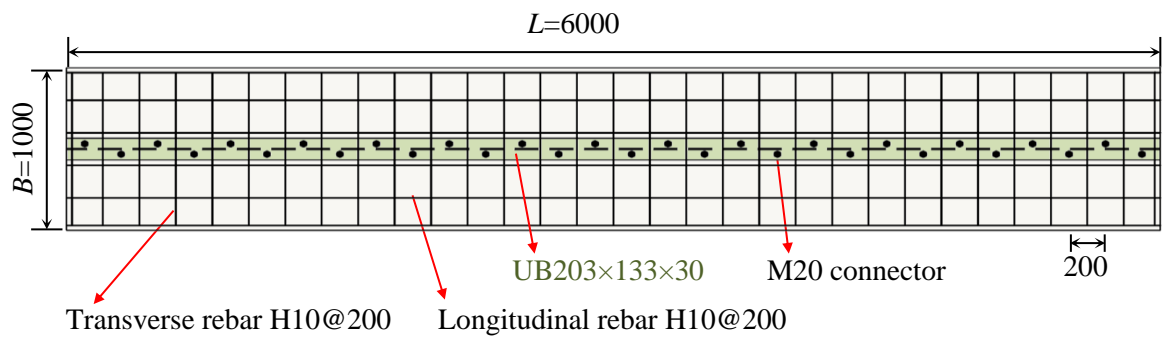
Details of steel beam – UB203×133×30 (unit: mm)
